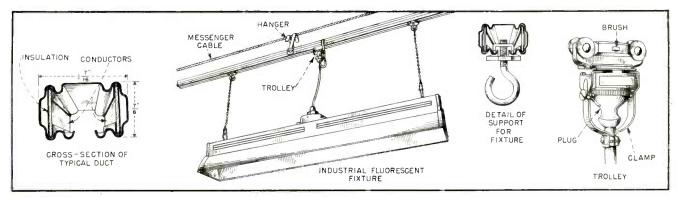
Details of trolley-duct wiring system used in receiver-assembly department to give complete flexibility for any required rearrangement of production lines
